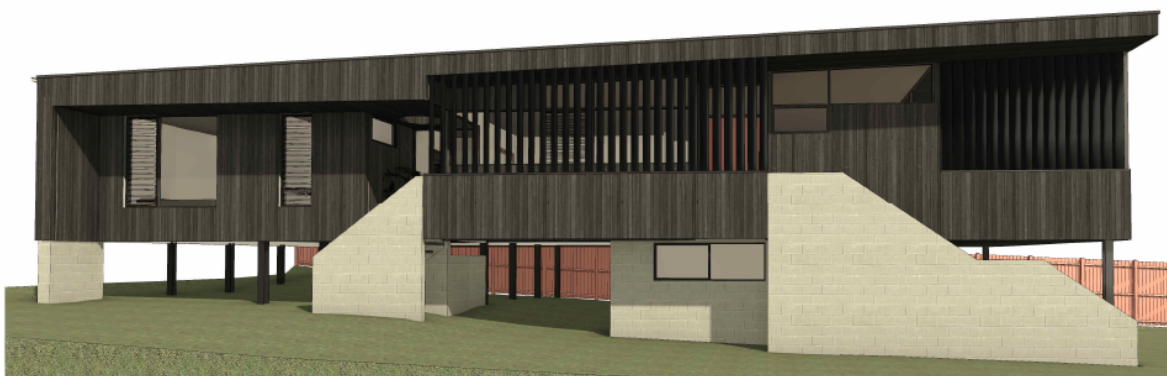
Indicative render of north facade showing stairwells, stumps and open underfloor areas
